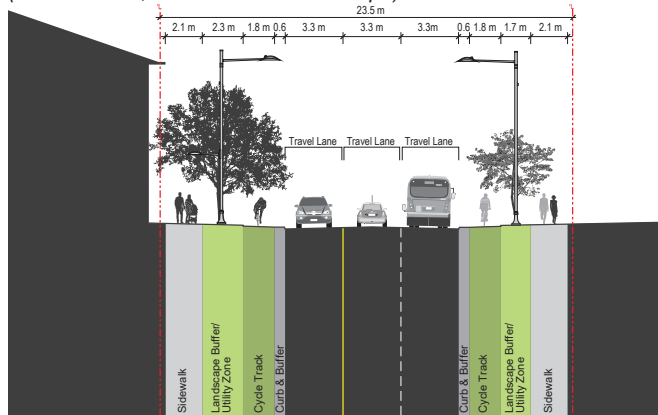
Condition at 96 Laird Drive with building abutting existing street right-of-way
